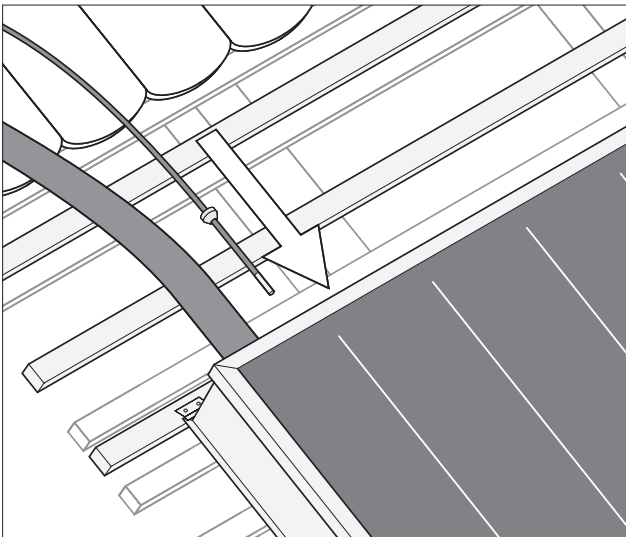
Slip rubber seal over cable, insert solar sensor into sensor sleeve; close opening with rubber seal and lead cable through roof.
